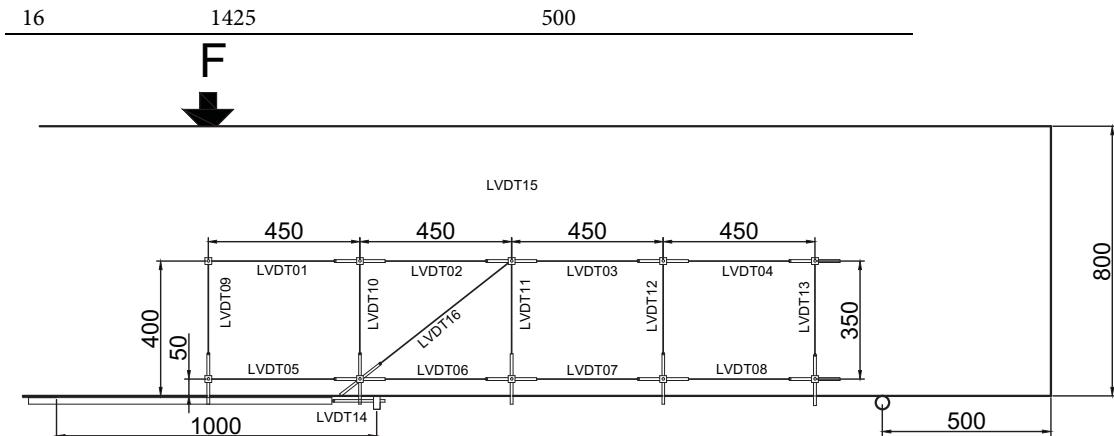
LVDT layout and numbering for 800 mm deep beams
